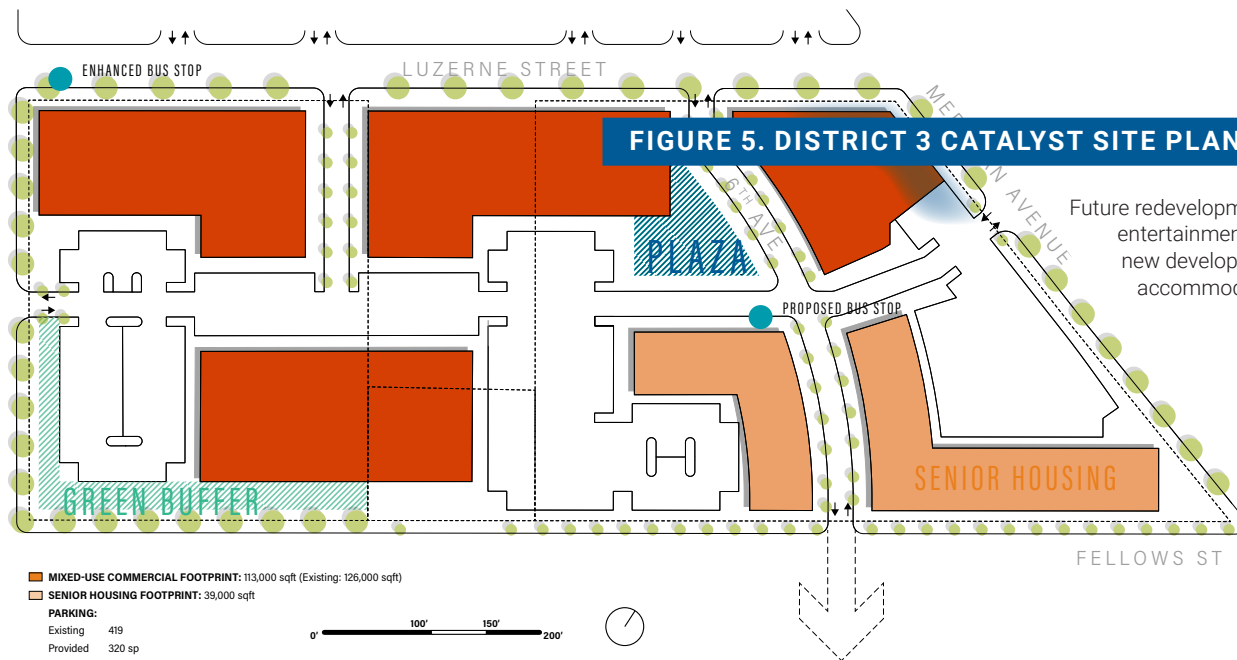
DISTRICT 3 CATALYST SITE PLAN - OPTION 2B
